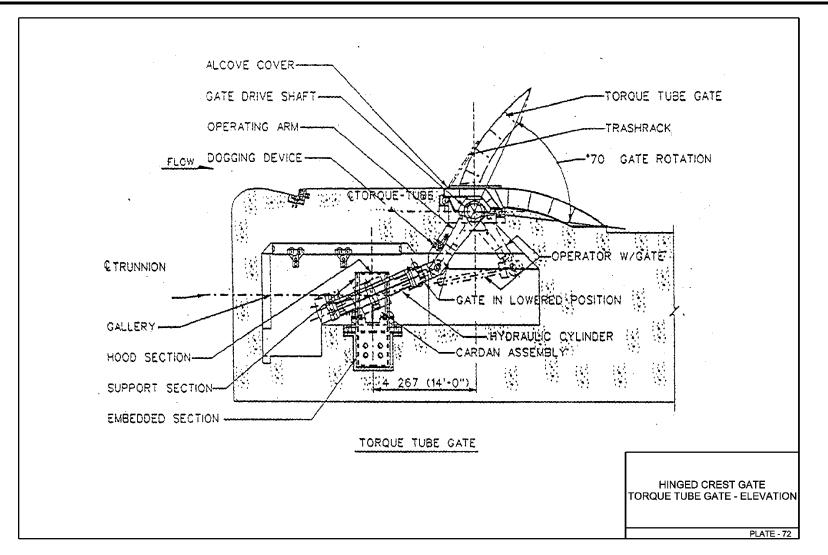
Plate 72: Hinged crest gate, torque tube gate – elevation
